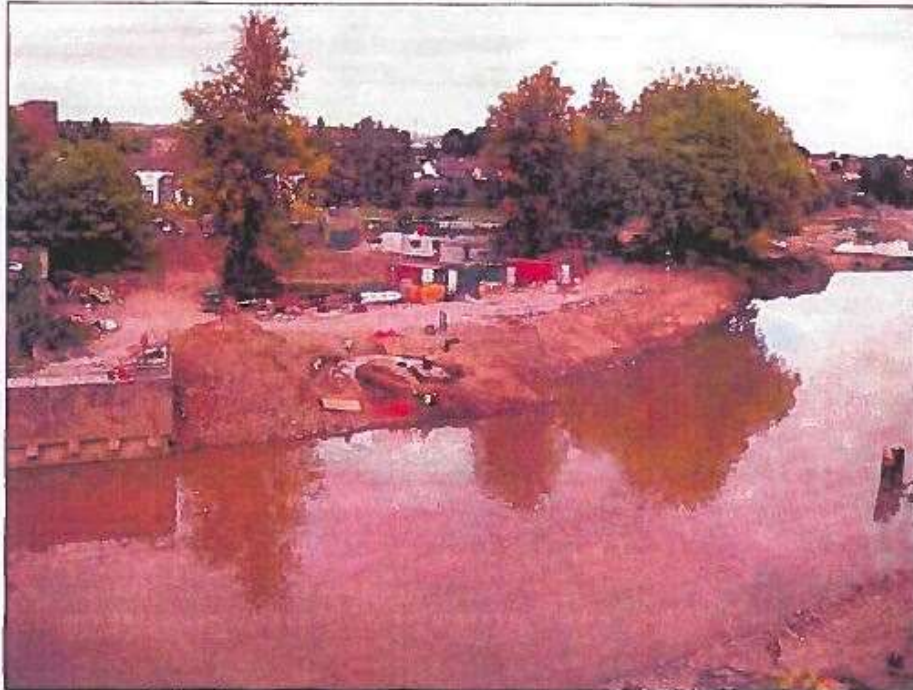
College Park Site B viewed during excavation from Kilkenny Castle
